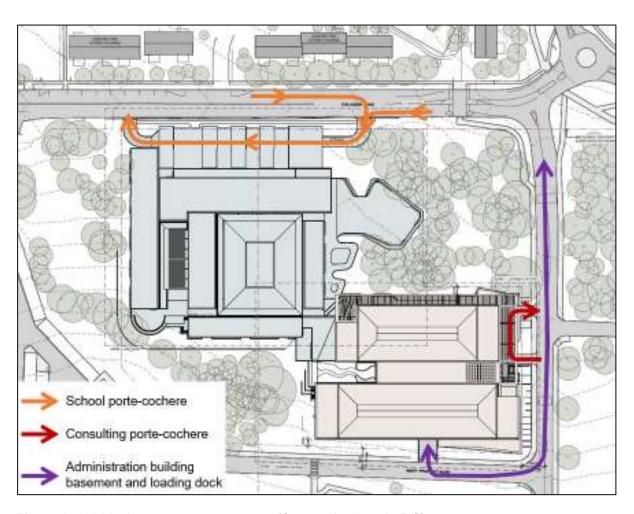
| Vehicular access arrangements (Source: Applicant's EIS)
